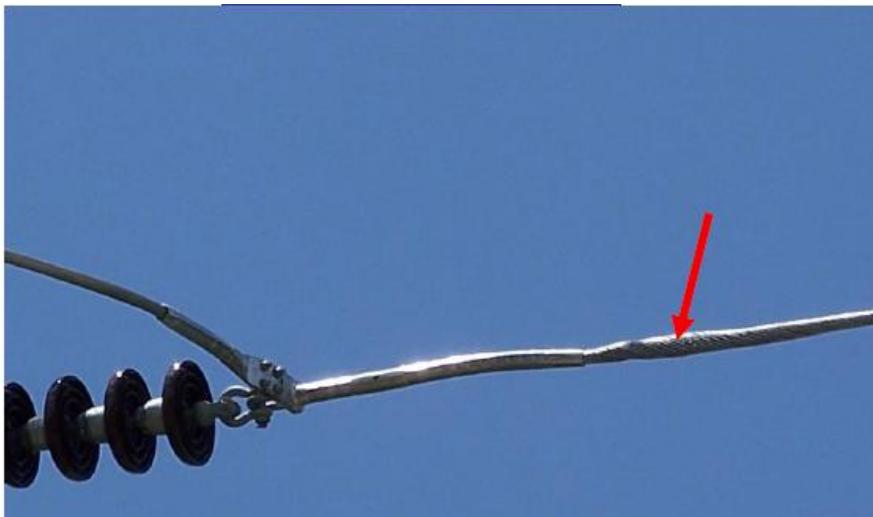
Bird-caging of Annealed Aluminum Conductor after Compressing Dead-end
